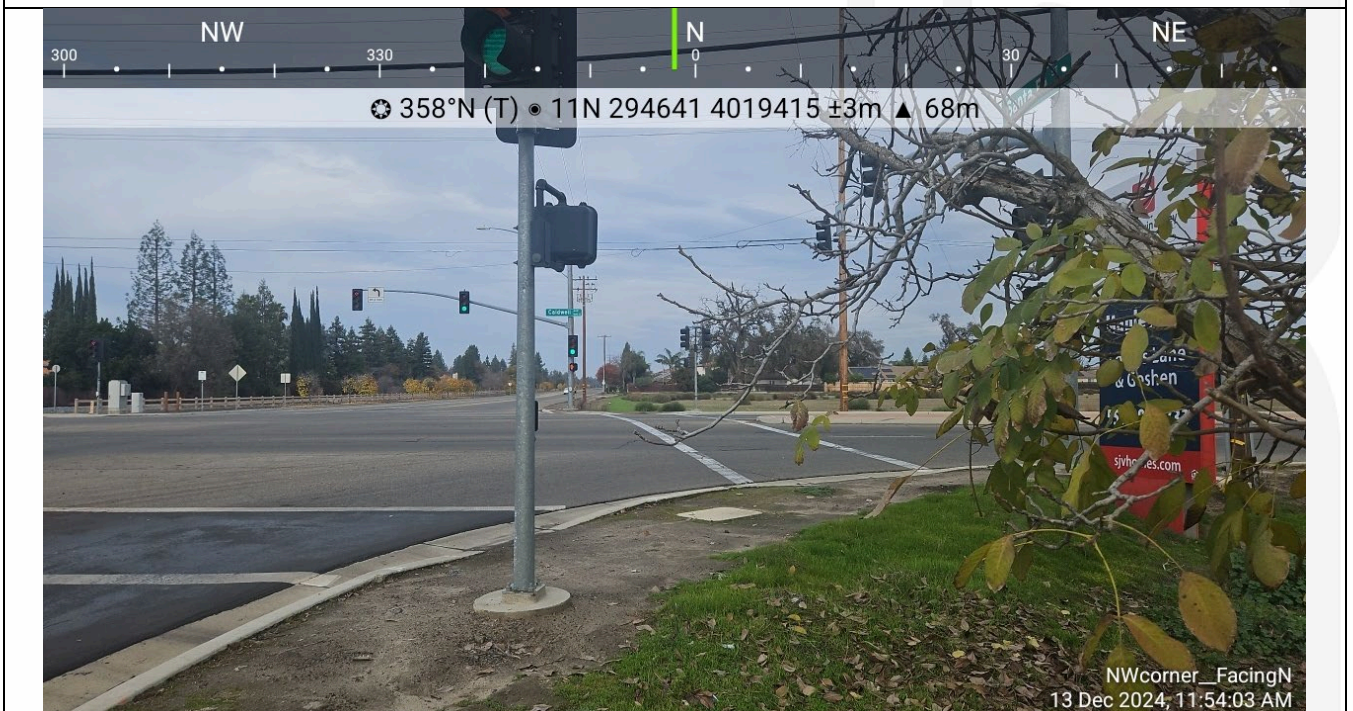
View of site conditions on the northwest corner of the project area facing north.
